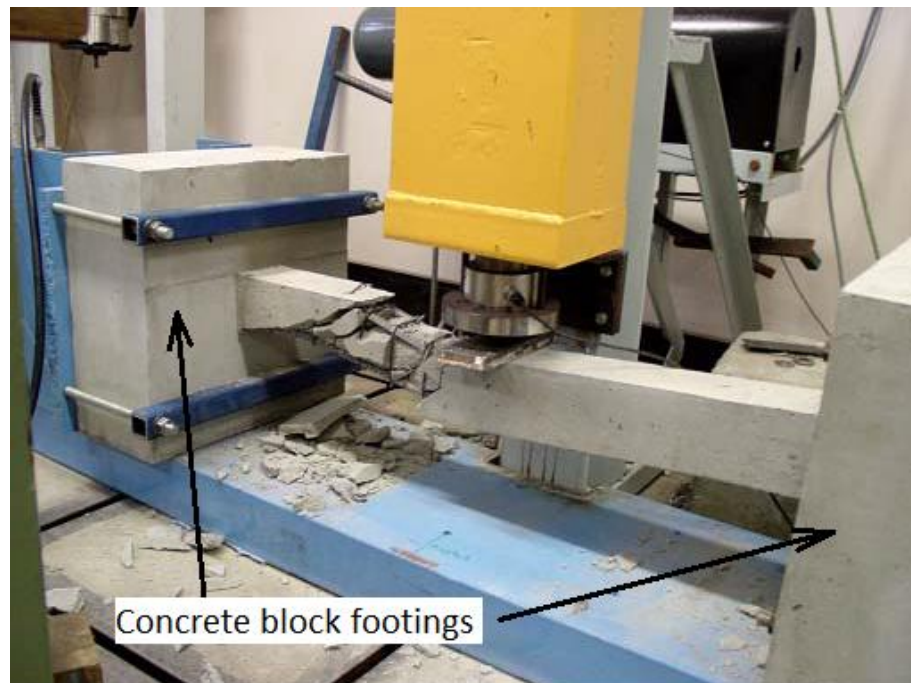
Impact test setup showing block footings and shear failure of specimen (Remennikov and Kaewunruen, 2006)
